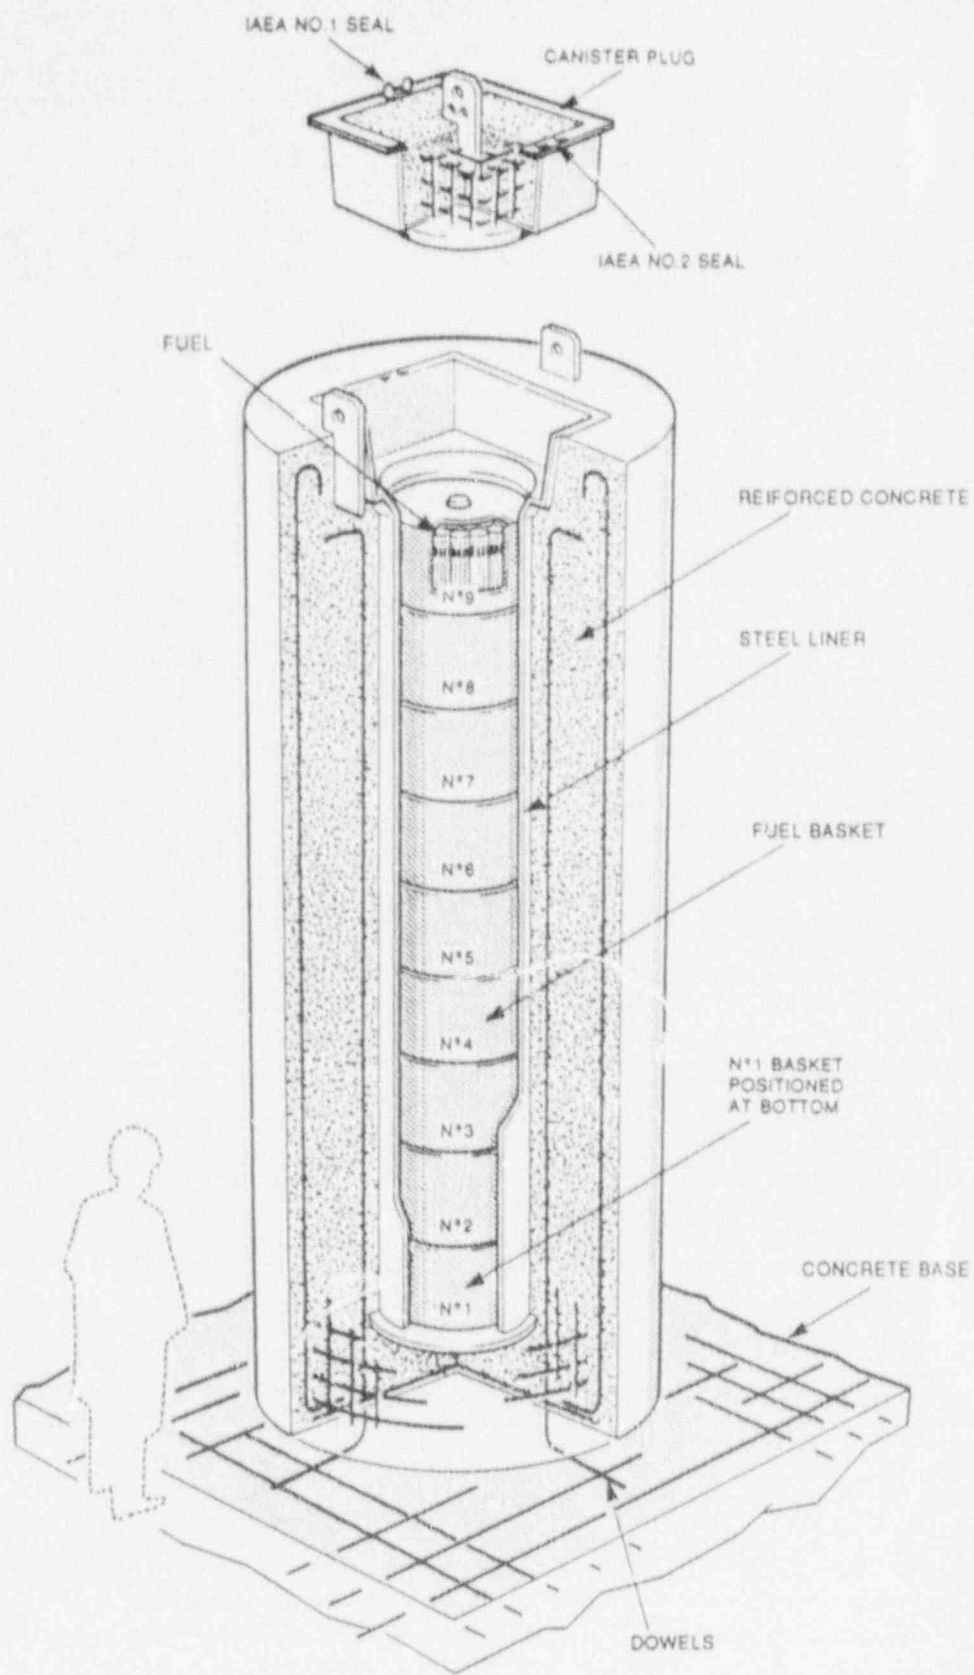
INTERIM DRY STORAGE CONCRETE CANISTER
